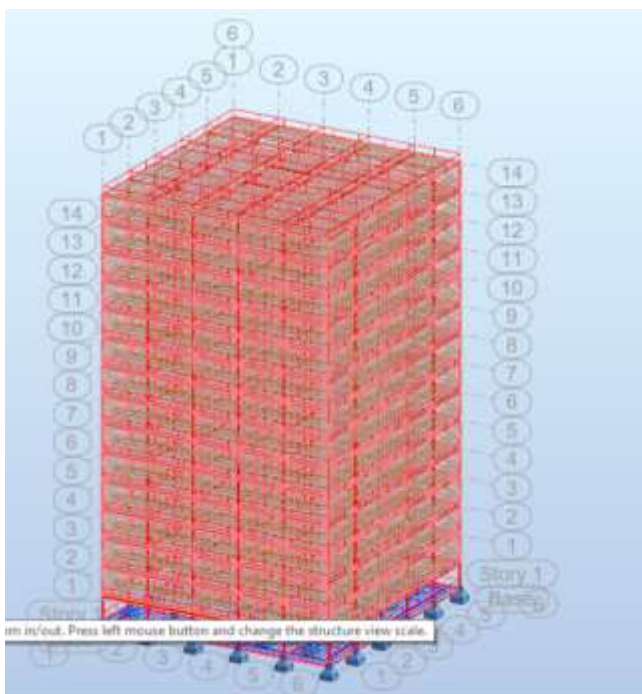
COMPLETELY MESHEd AND LOADED BUILDING.
